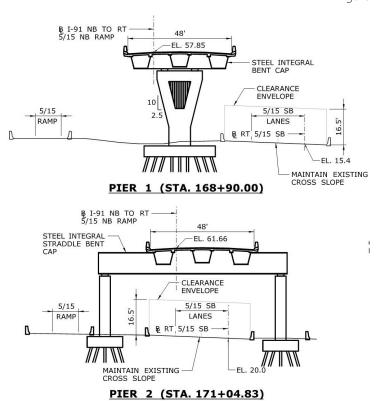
As Given Pier 1 and Pier 2 Elevations
